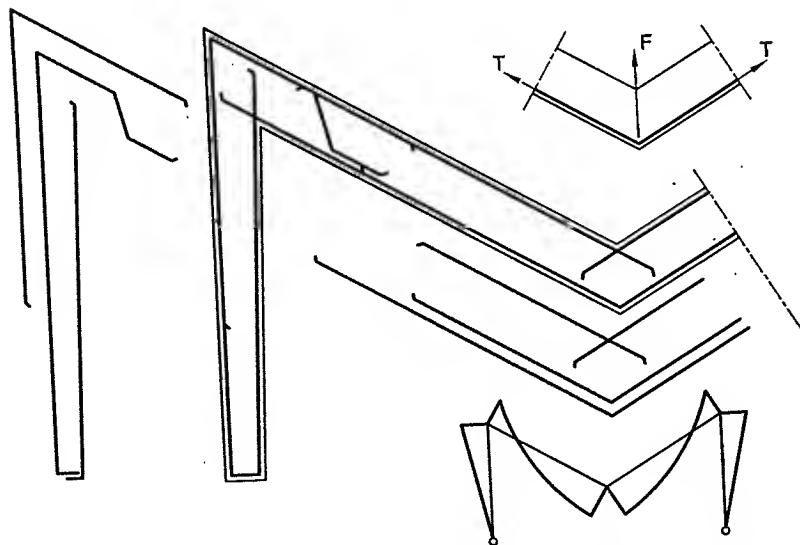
Detailing of Frame Joints (Detail-10)
